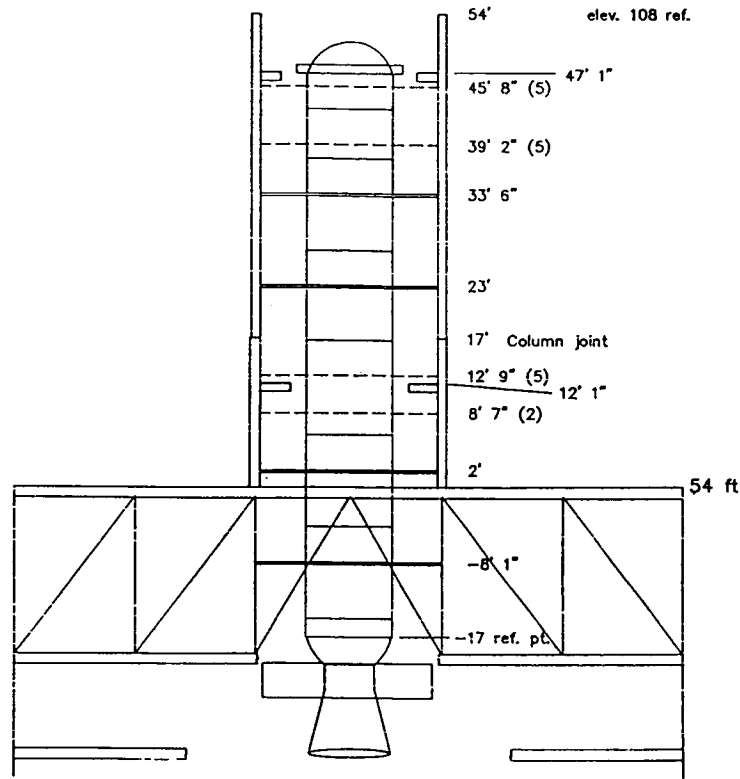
5-1/2 MOTOR SEGMENT SETUP
